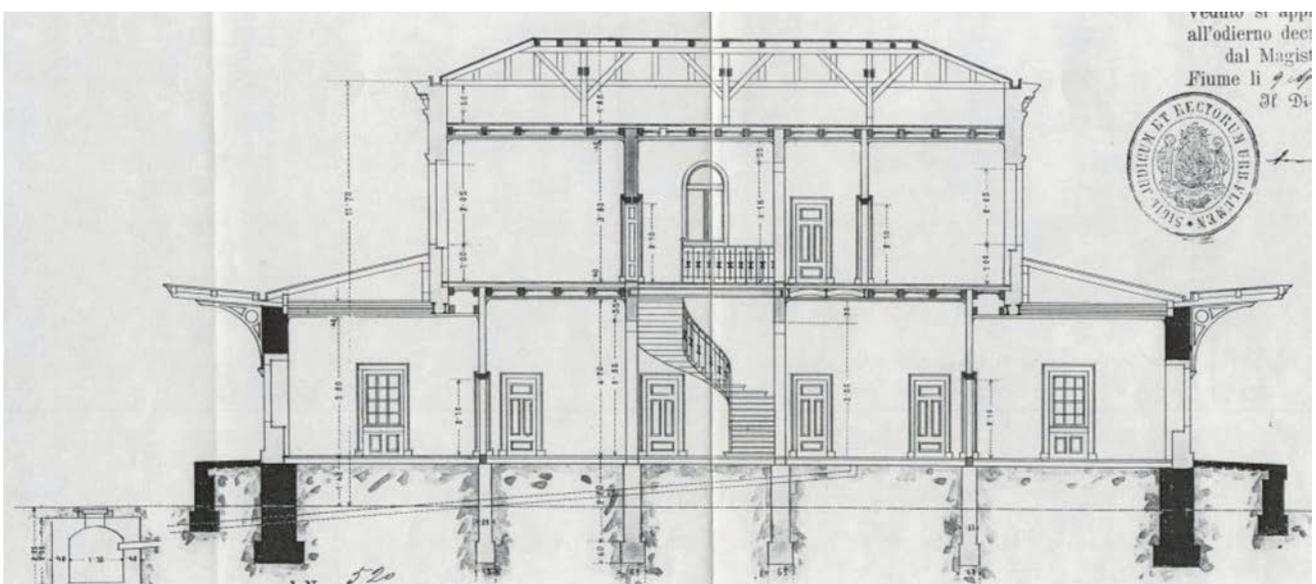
Railway warehouse 31, 1890, transverse section through office section [6]
